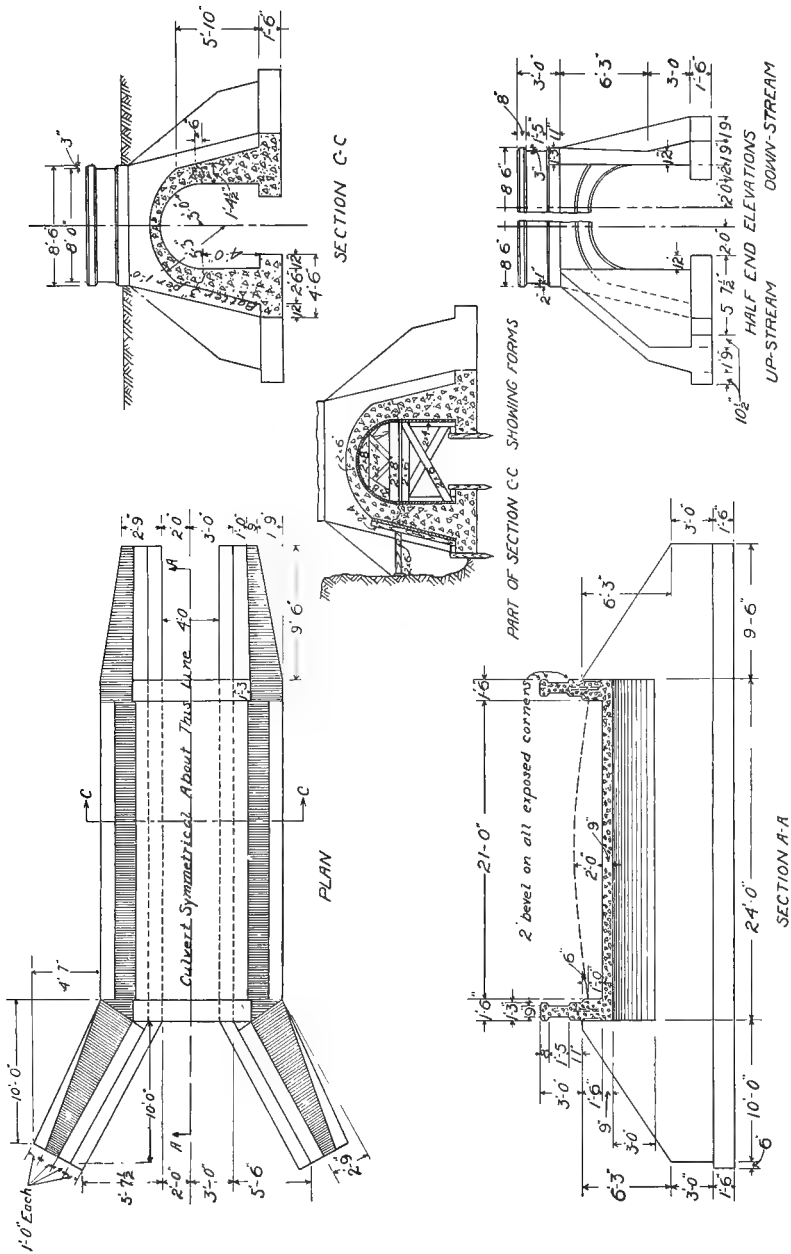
Plan for a Plain Concrete Arch Culvert. Span 6 feet. Office of Public Roads. U. S. Department of Agriculture.
